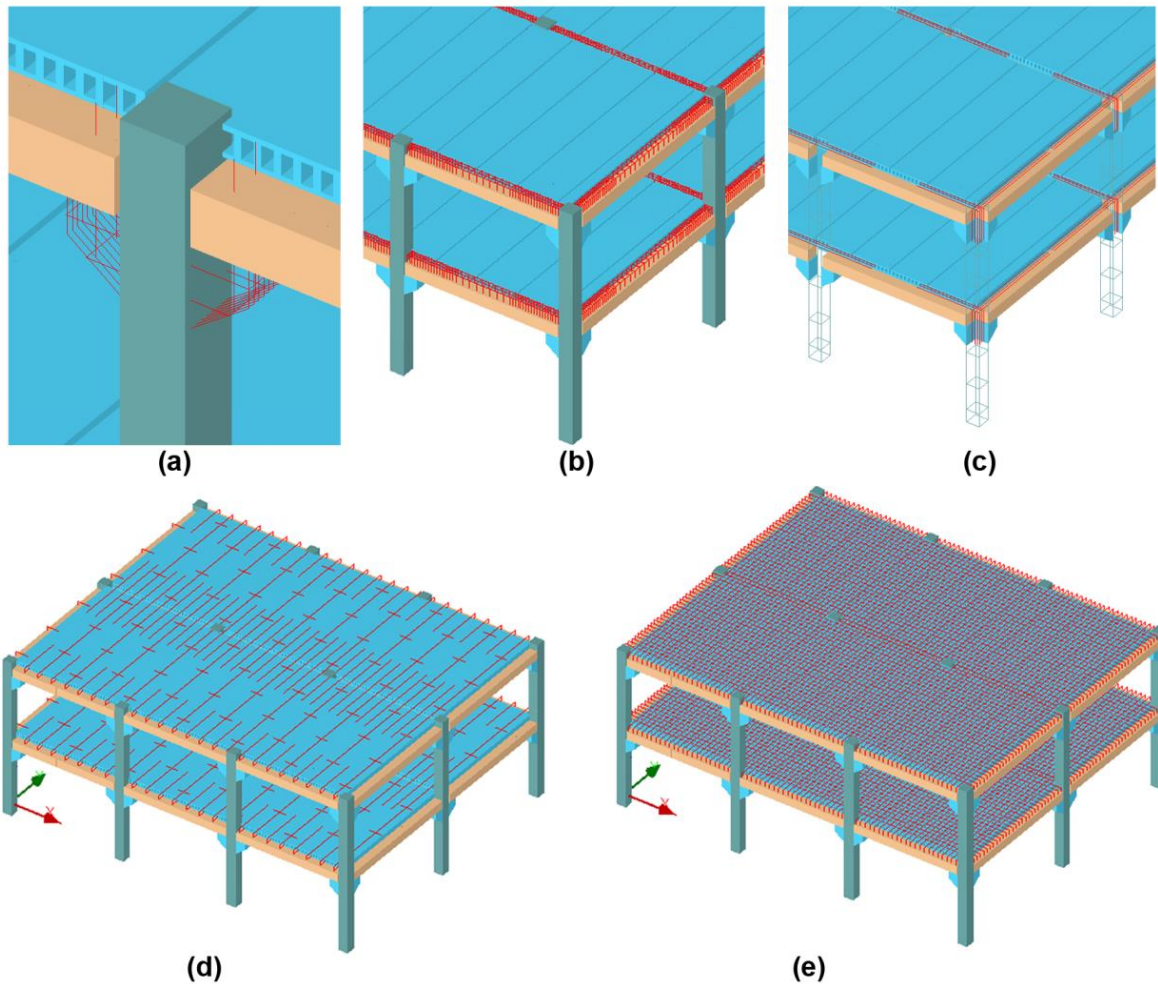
(a) Corbel reinforcement and dowels passing through the precast beams; (b) Stirrups stemming out of precast beams and additional longitudinal reinforcement; (c) tie reinforcement; (d) Reinforcement between hollow-core slabs; (e) Mesh in topping.
